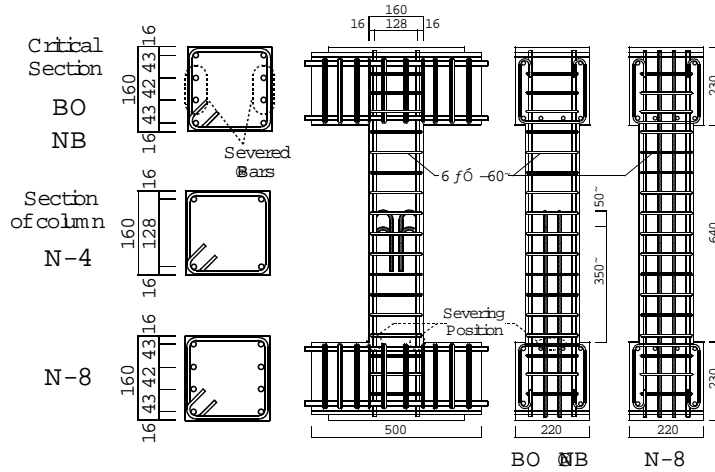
Dimension and detail of specimens for bending test with axial compression
